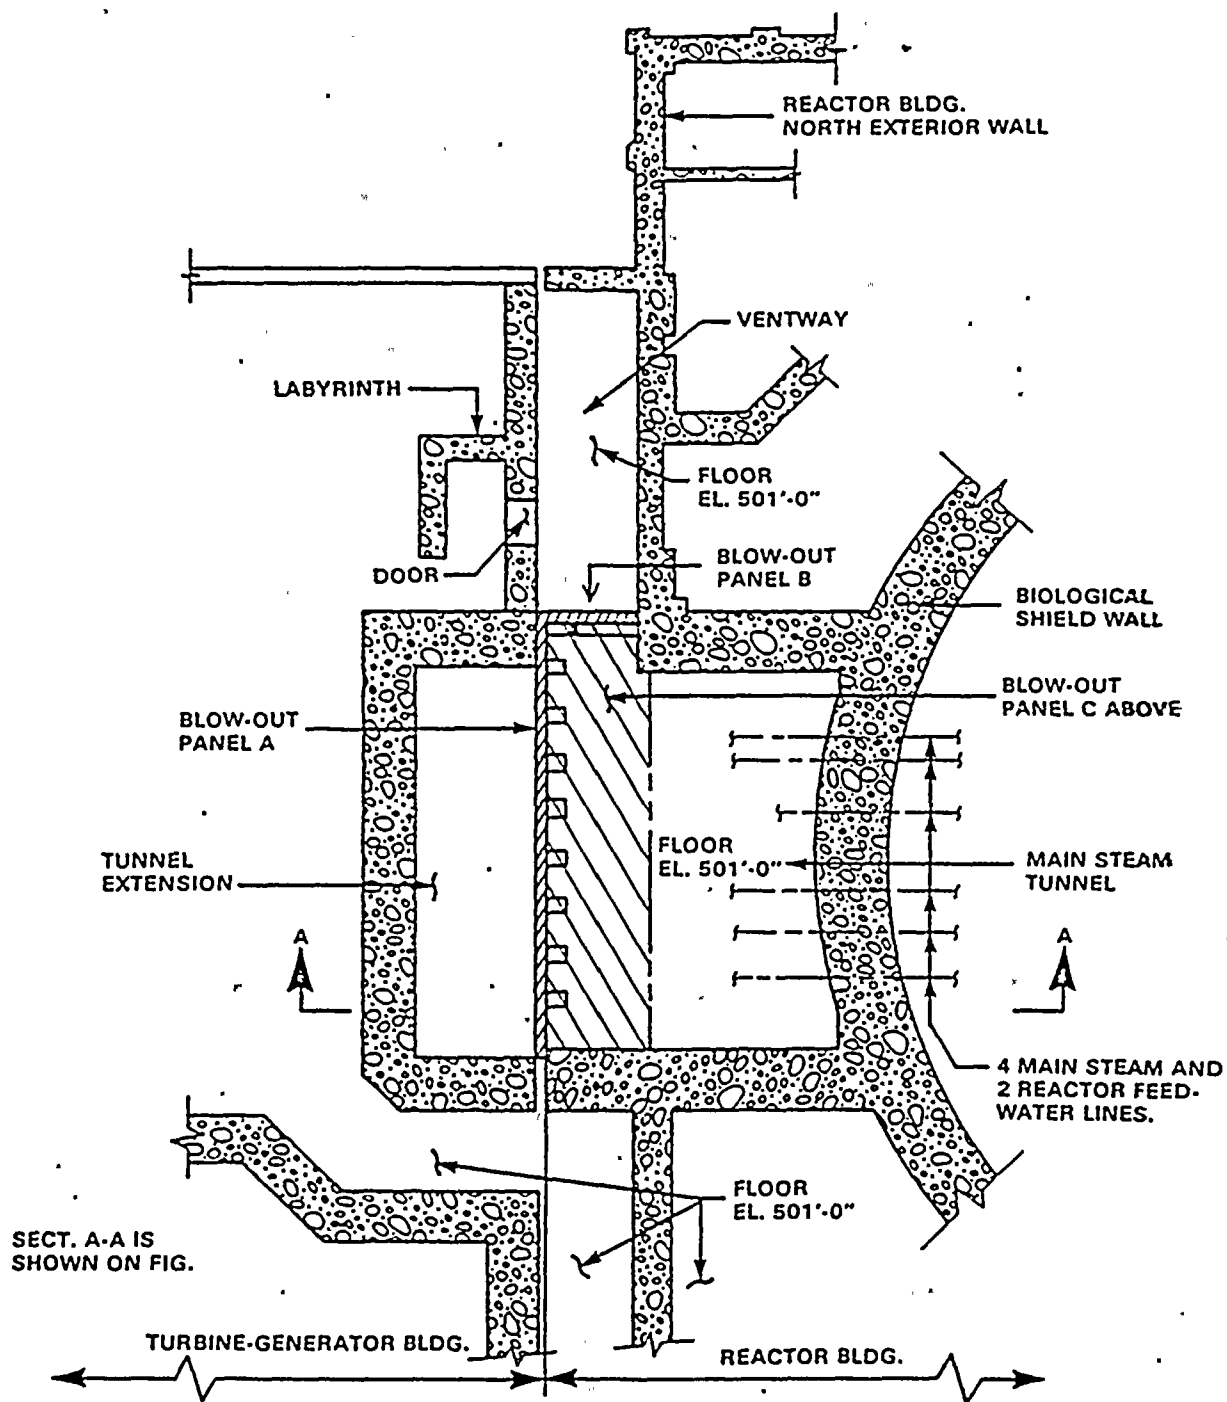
MAIN STEAM TUNNEL VENTWAY AND TUNNEL EXTENSION
